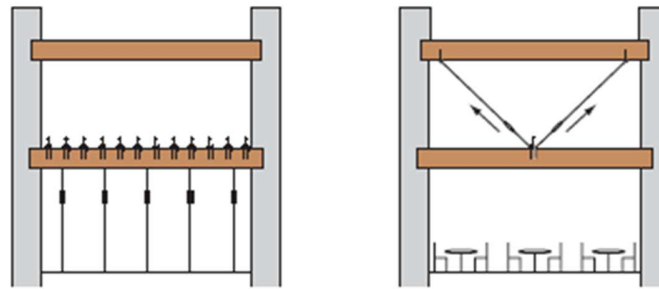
Possible Solutions to Support the Diaphragm to Retrofit
